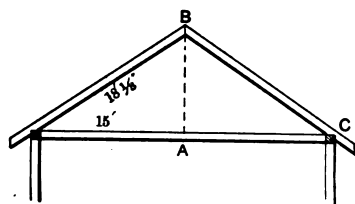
Elevation of Roof, Showing Rise and Run of Rafter.
